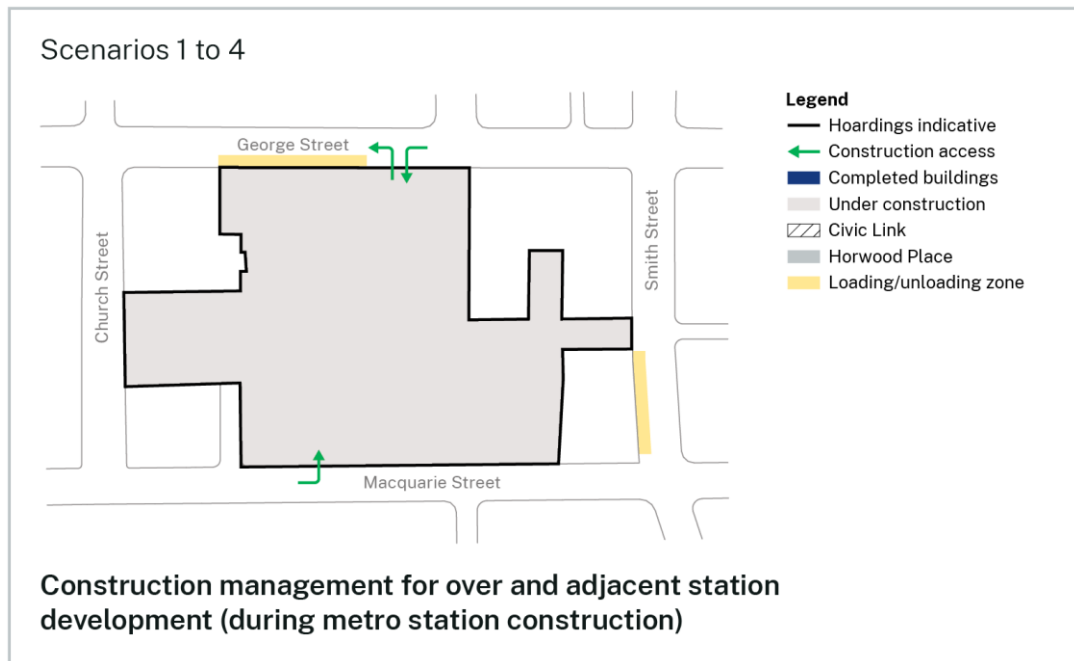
Proposed site materials handling demarcation plan during metro construction
